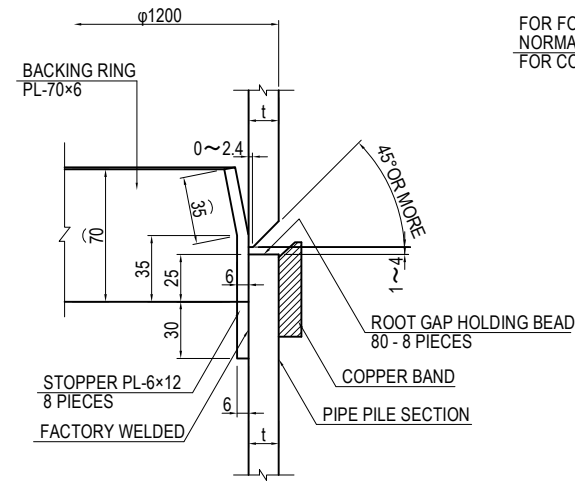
DETAIL OF STEEL PIPE SHEET PILE TOP S=1:40
